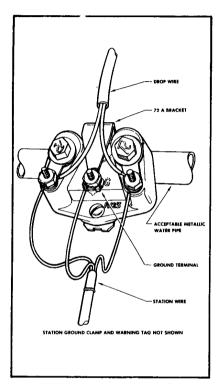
123 Type Protector Installed on a Metallic Water Pipe (for Indoor Use Only)
